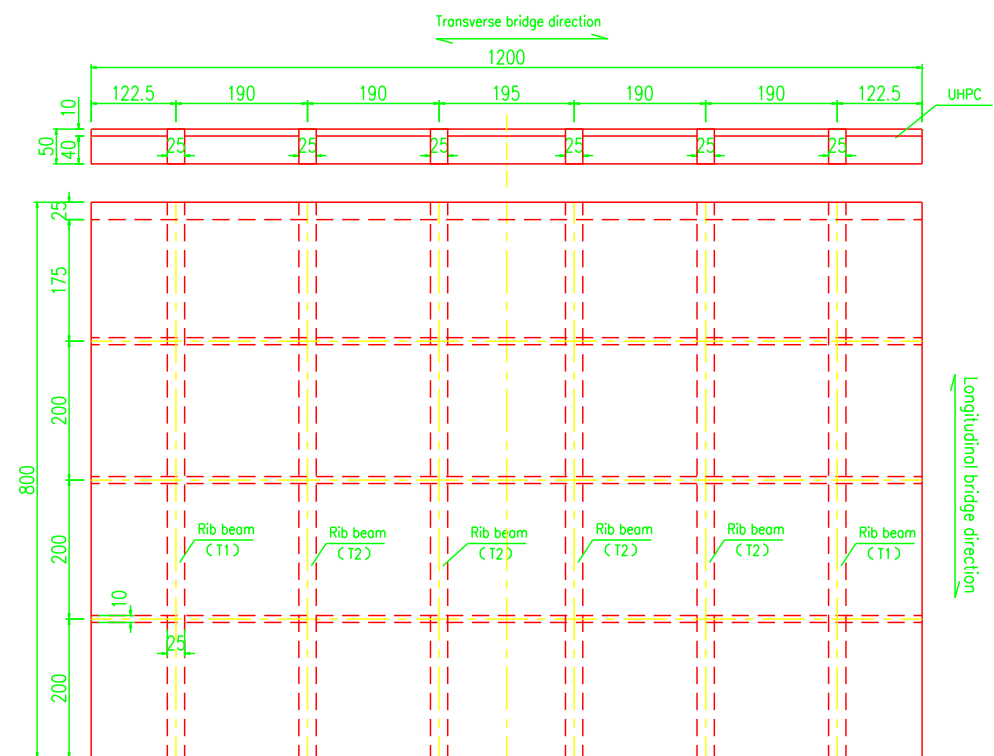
Structural section and plan view of the approach slab (unit: cm)
